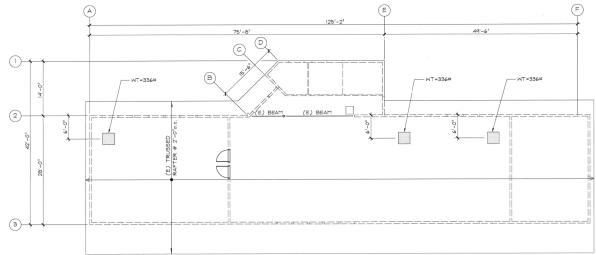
BUILDING 11: 2017 HVAC Upgrade Roof Framing Plan
